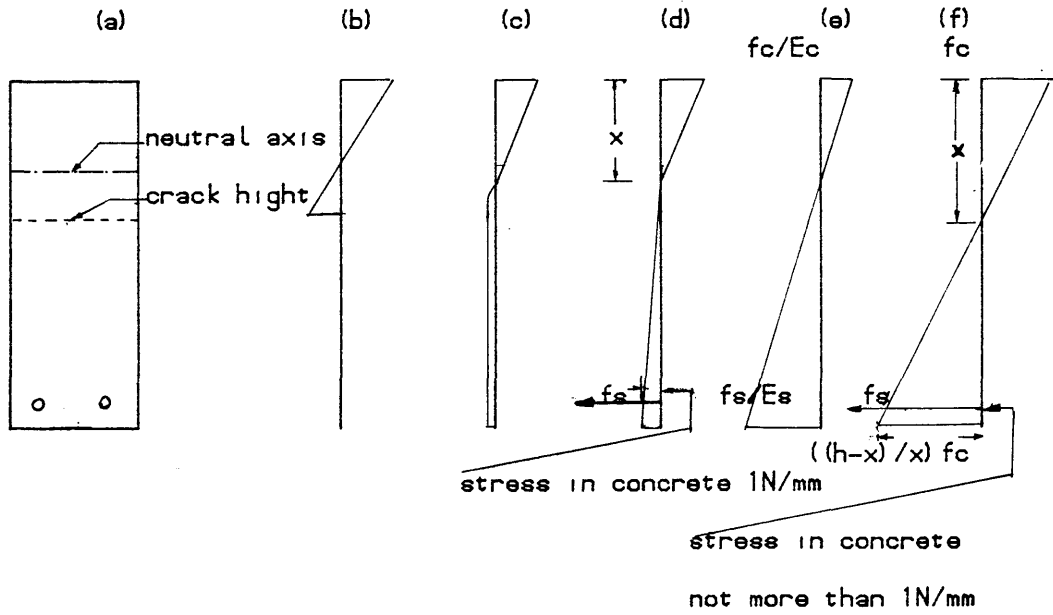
Concrete flexural stresses, (a) cracked section (b) at crack (c) between cracks (d) average (e) strains (f) section not cracked
